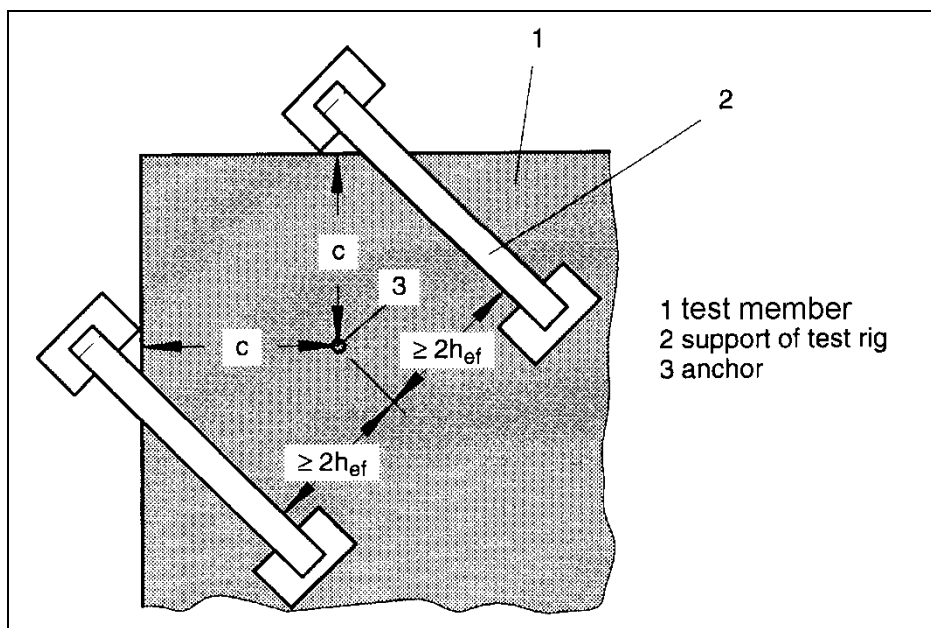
Example of the test rig for tension tests on fasteners at a corner
